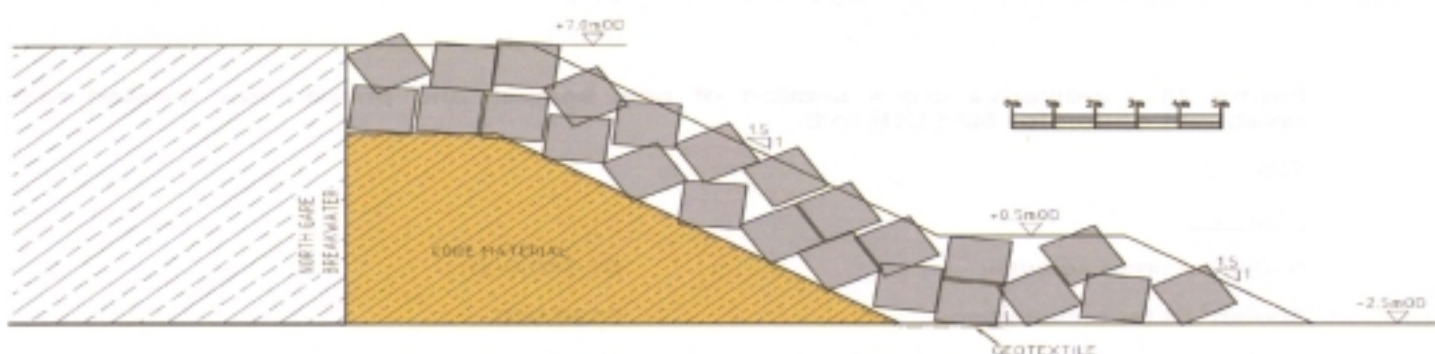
INDICATIVE CROSS SECTION OF NEW CONCRETE CUBE ARMOUR TO NORTH GARE BREAKWATER.
